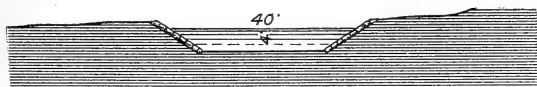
Earth section of original Erie canal. Width of bottom of canal 26 feet.
